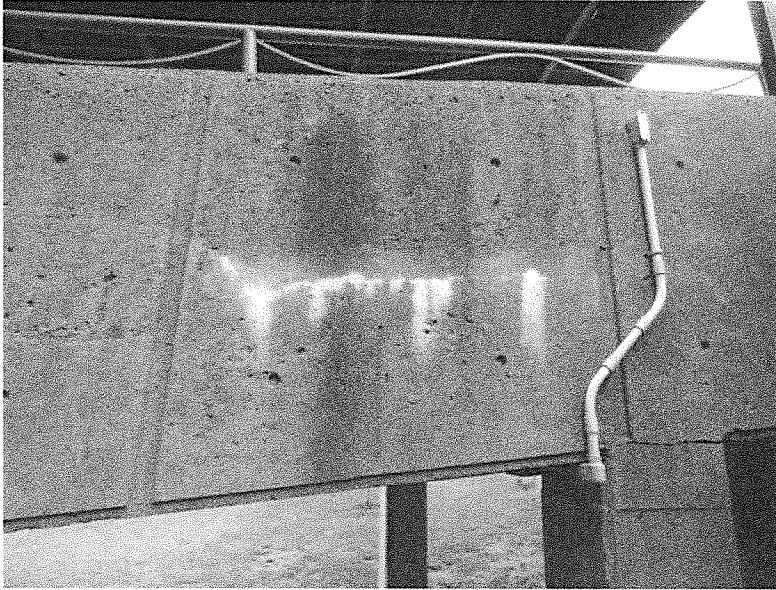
Cracks in concrete with efflorescence at west side of pedestrian bridge
